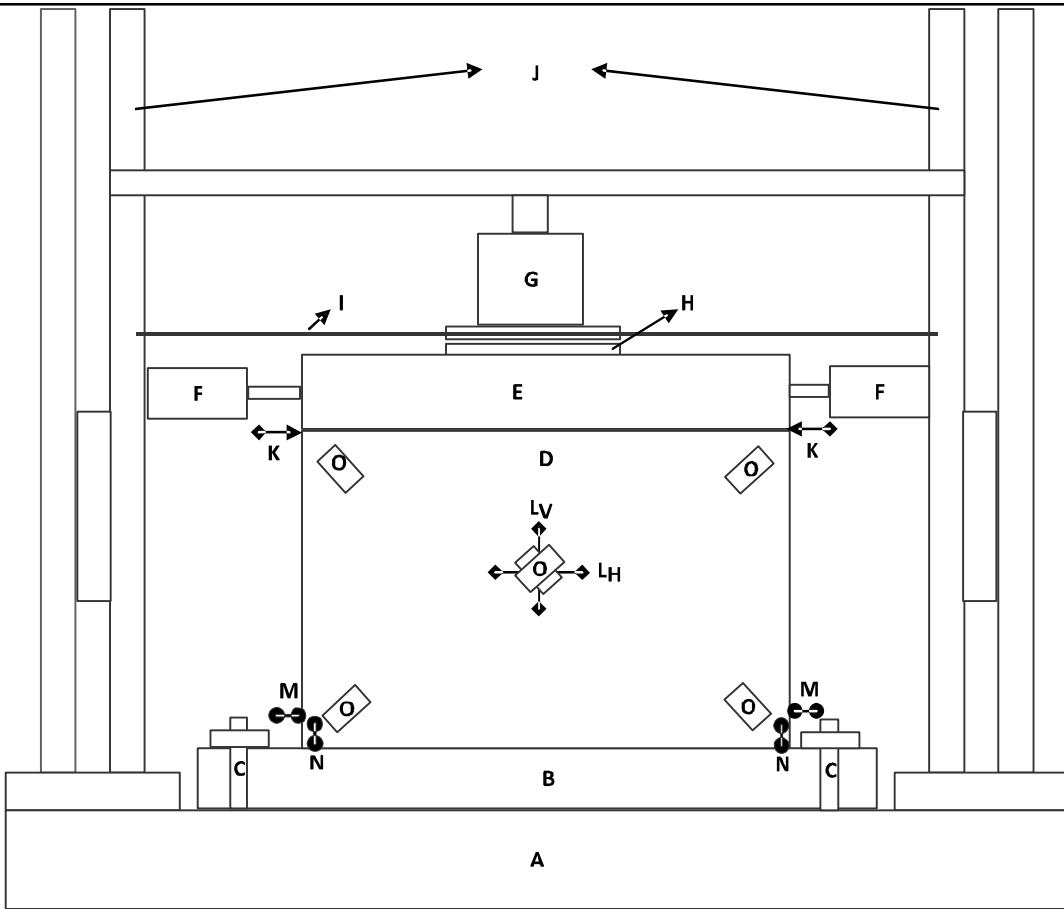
INSTRUMENTATION OF MASONRY WALL PANEL
